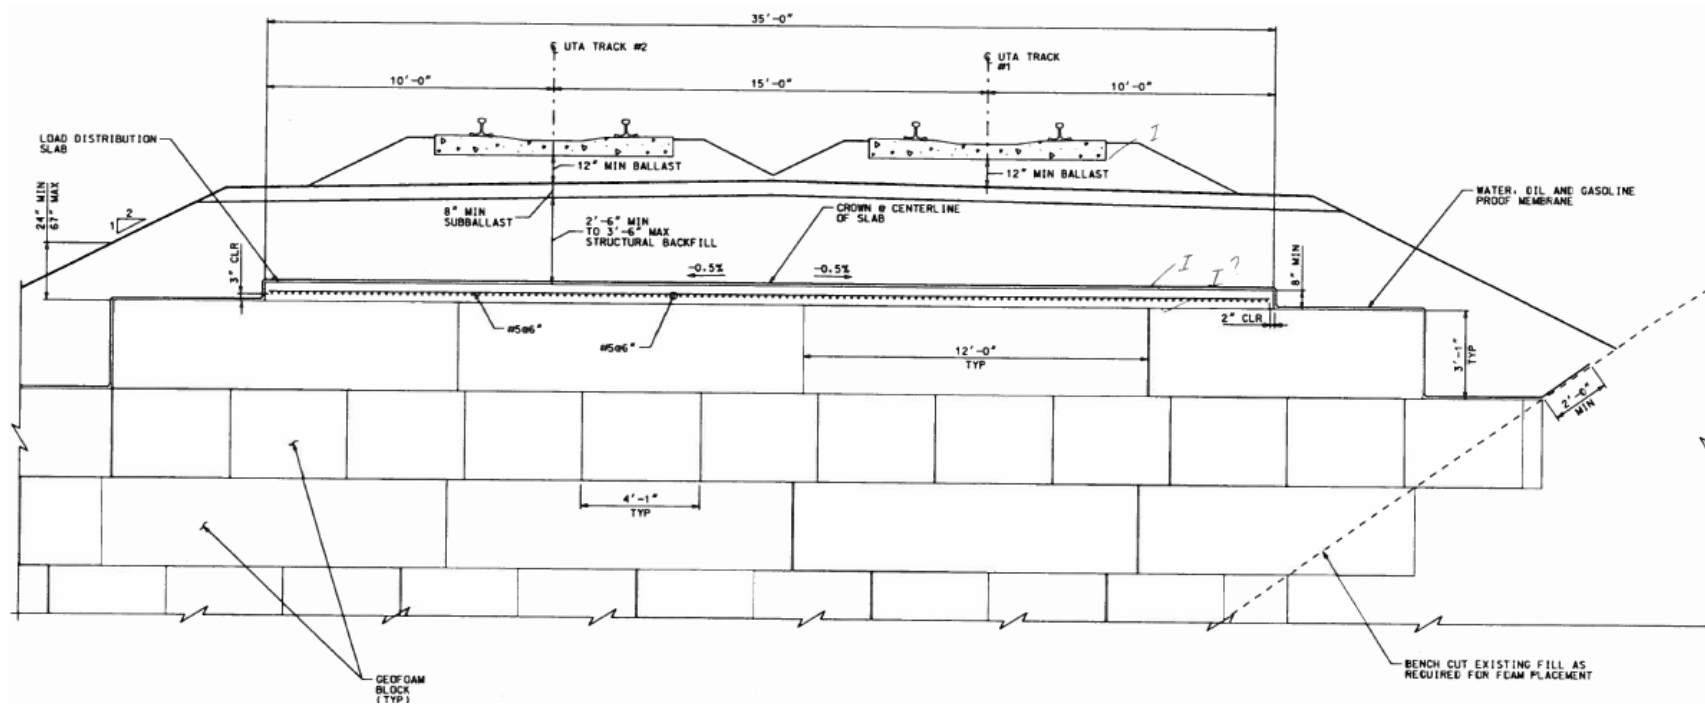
EPS Cross-section of the EPS-supported Embankment at Corner Canyon
